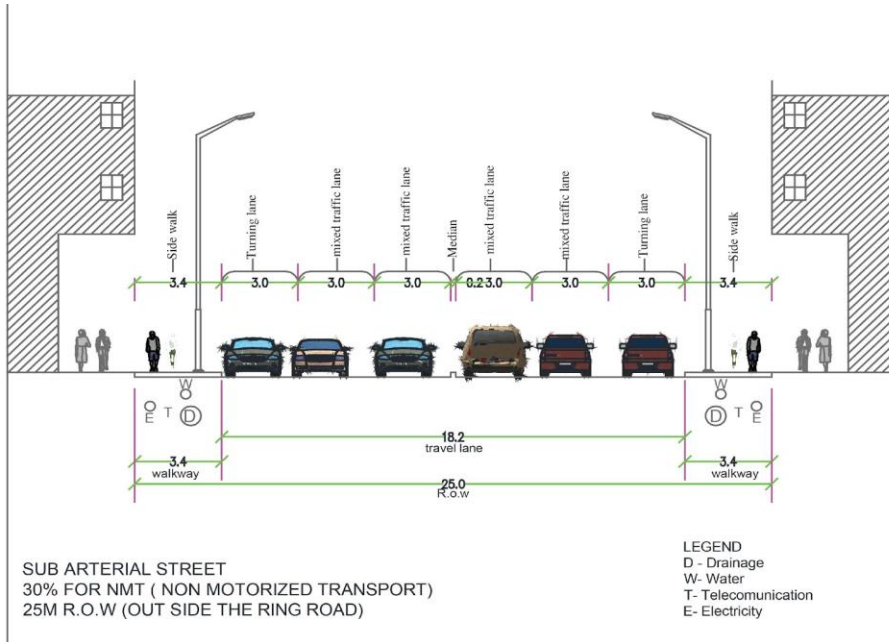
Street section (b) of Sub-Arterial Road outside the inner ring road
